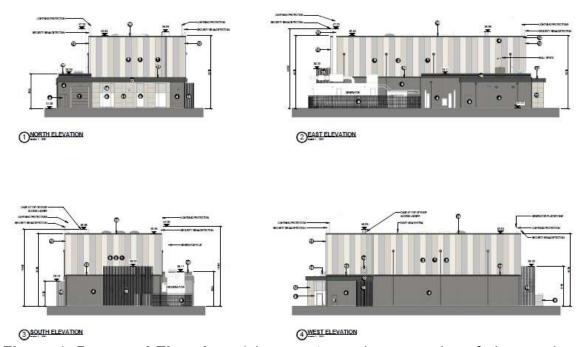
Proposed Elevations (please note – a larger version of plan can be found in the Committee Plan Pack)
